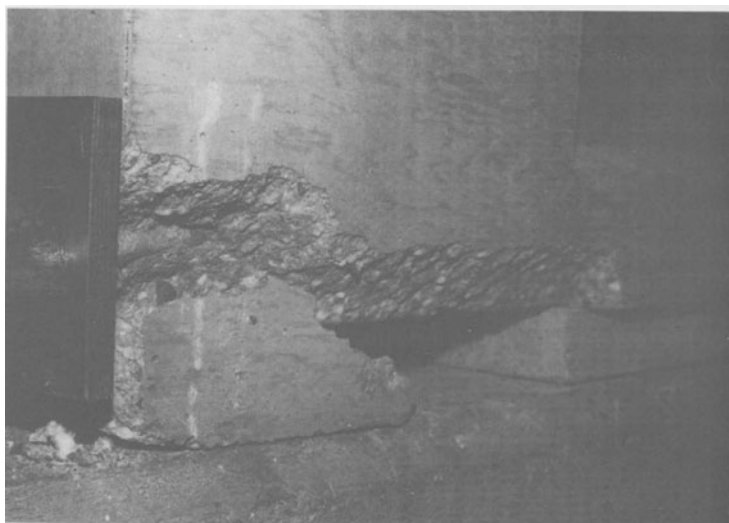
Failure of an Anchorage Zone Block in one Test Beam
